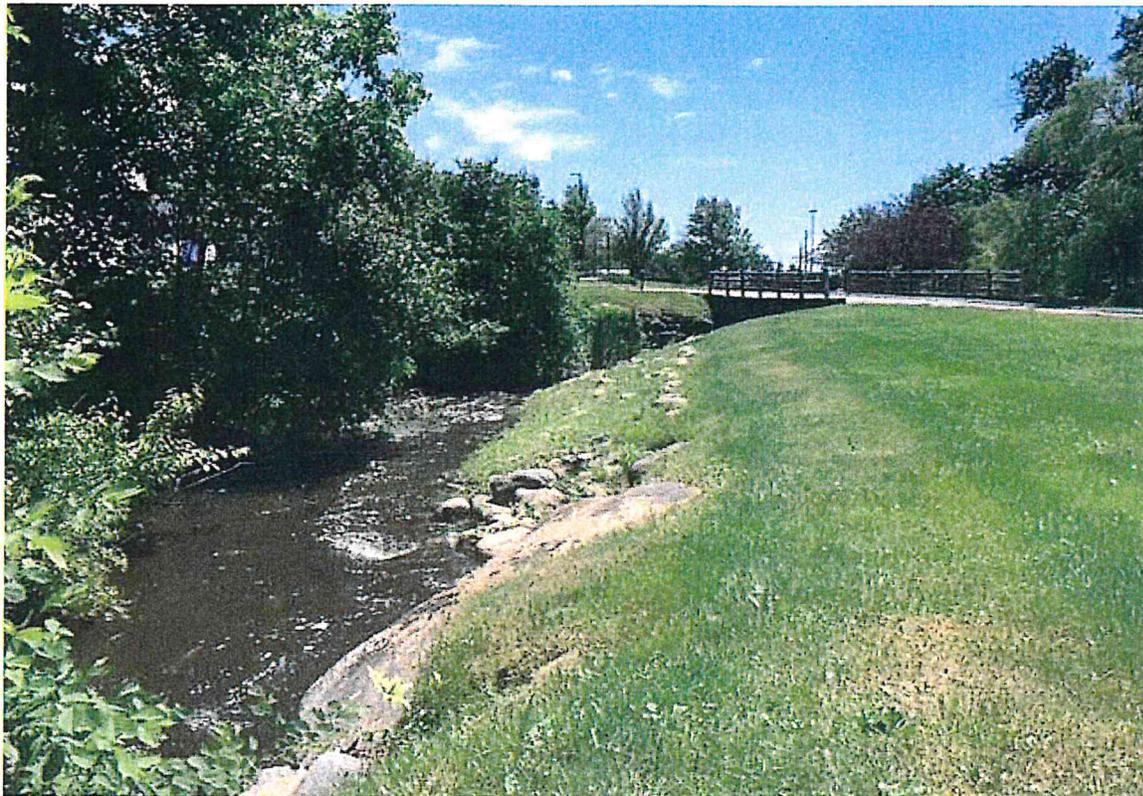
River Section 5551 Near High School Bridge (Looking Downstream)
